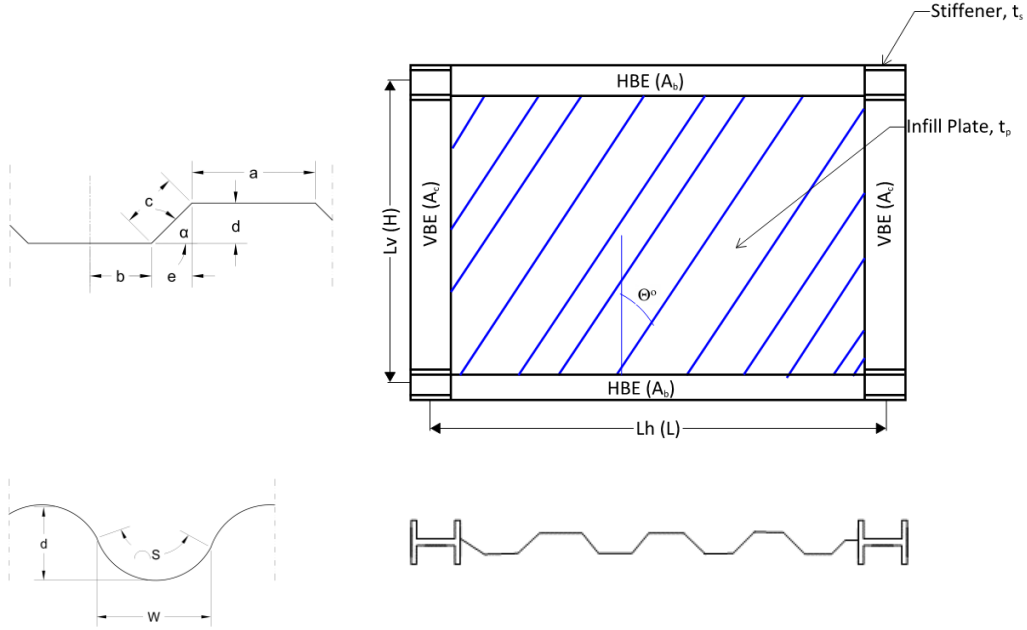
Shear wall sketch with corrugated infill plate data^[5]
